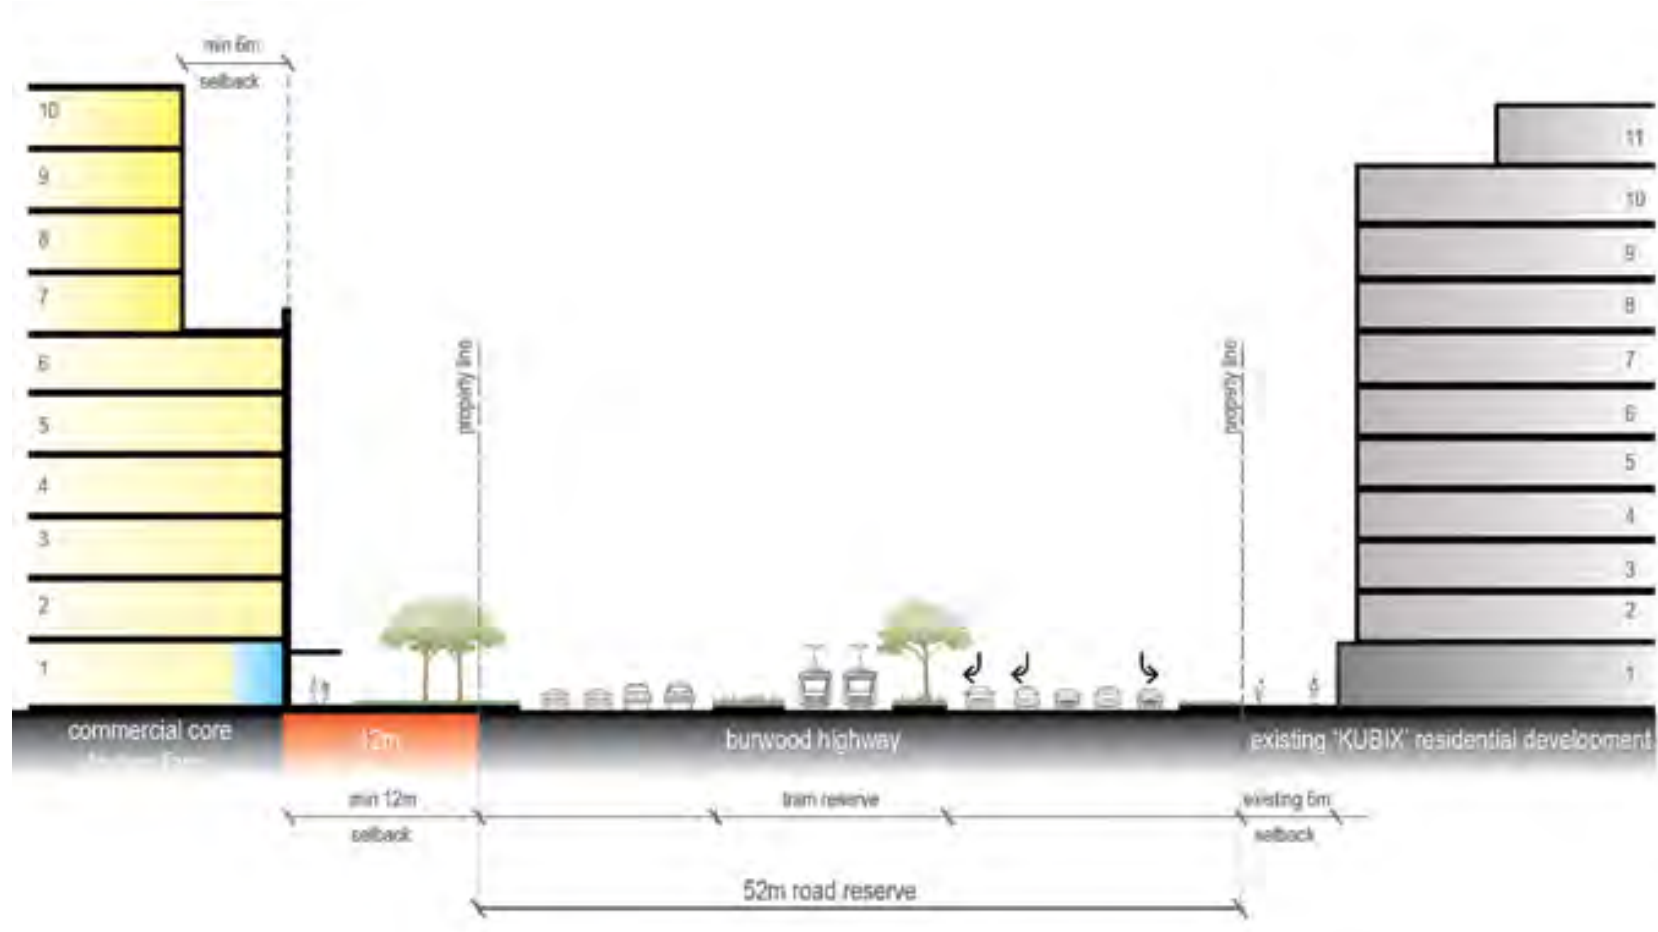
Section Diagram Commercial Core 'feature form' and Burwood Highway South Interface (existing Kubix building) (Section a)
